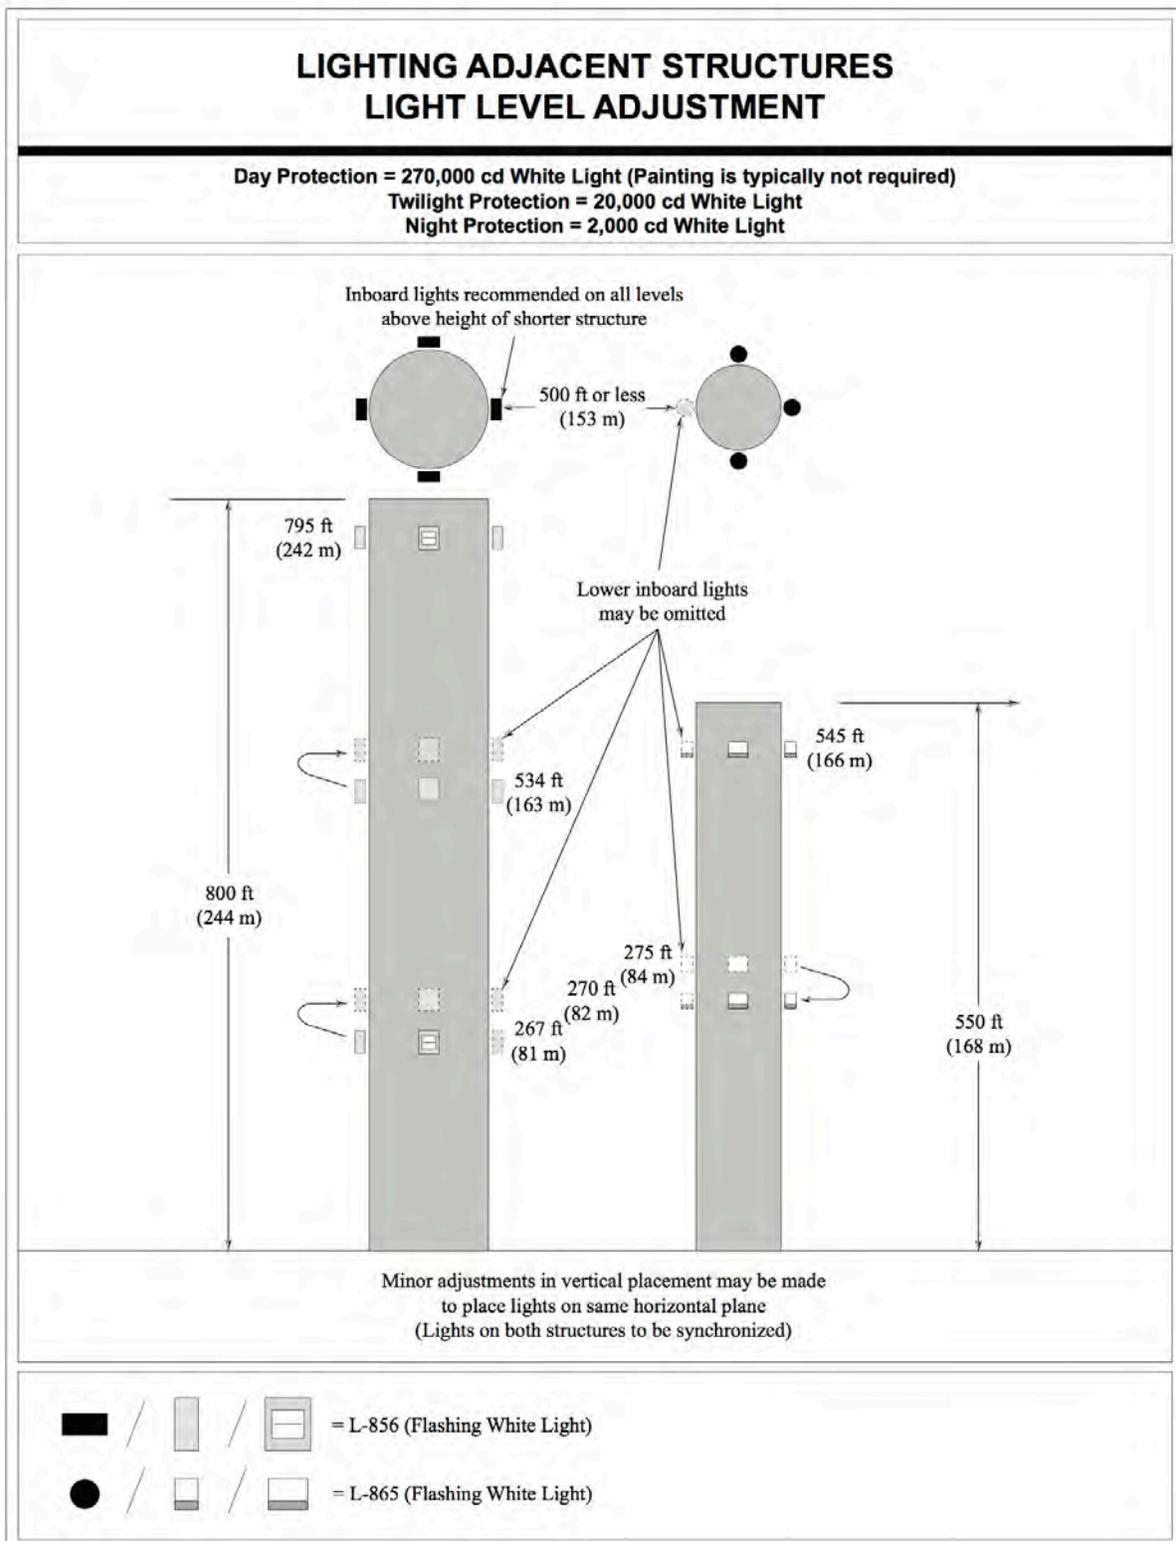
Lighting Adjacent Structures—Light Level Adjustment
